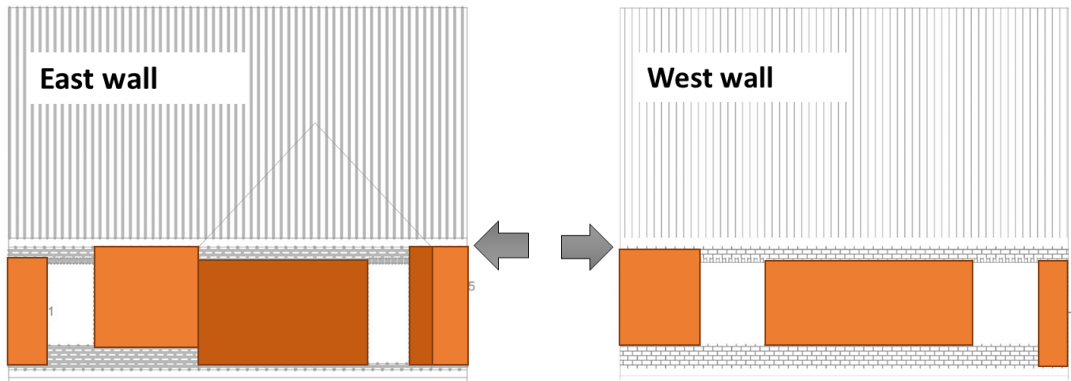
Piers defined on the east and west walls of Building A for the negative loading (north to south) in the Y-direction. The darker colour indicates the piers on the wall of the annex.
